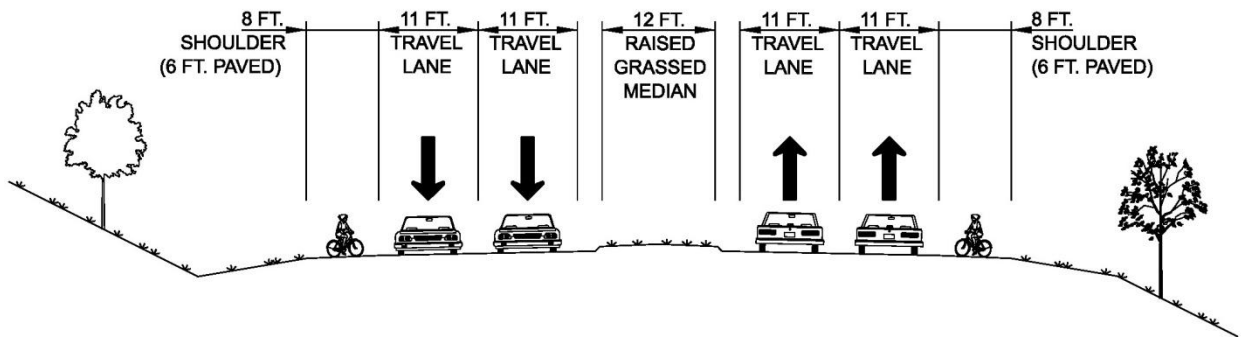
SEGMENT 3B PROPOSED TYPICAL SECTION
